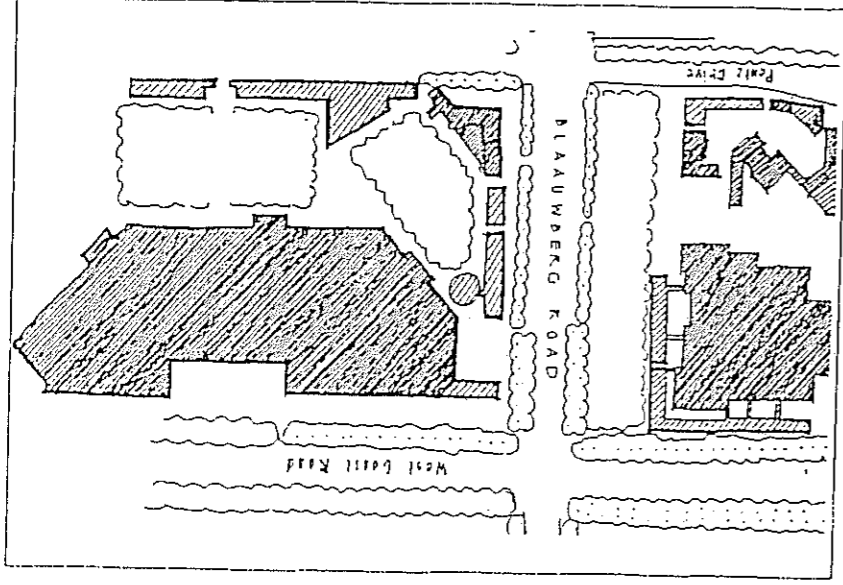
West Coast Road/Blaauwberg Road: Proposed Development Framework
